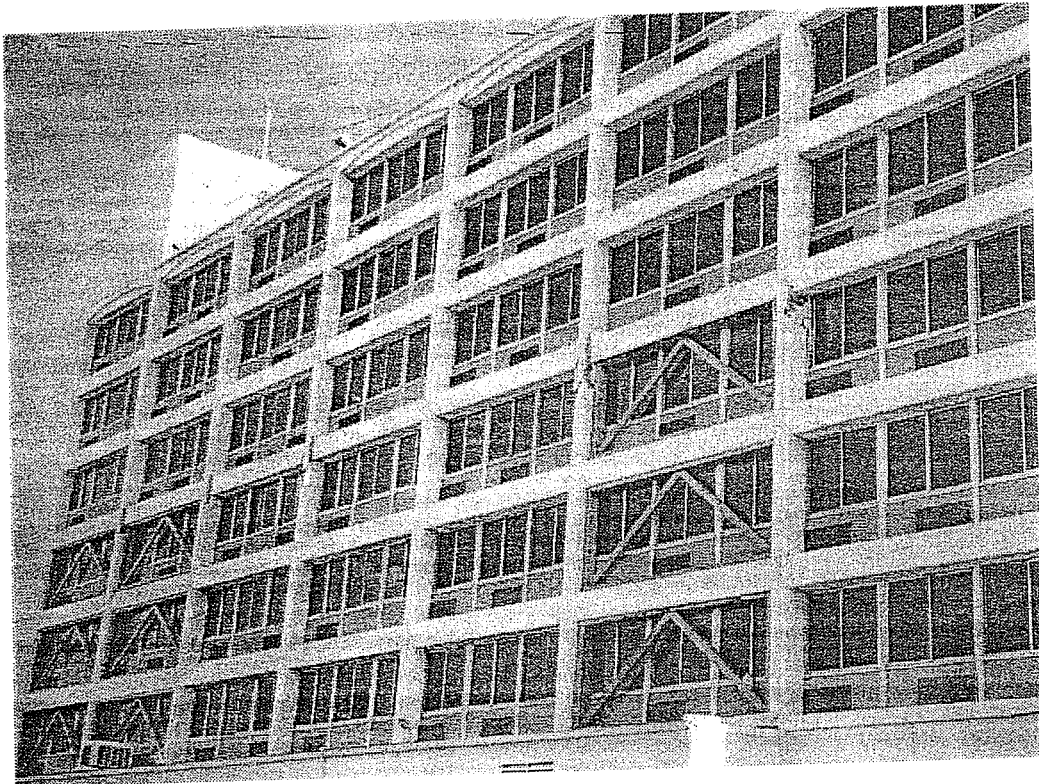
South Perimeter Frame Elevation with Temporary Shoring after the 1994 Northridge Earthquake⁴⁵
